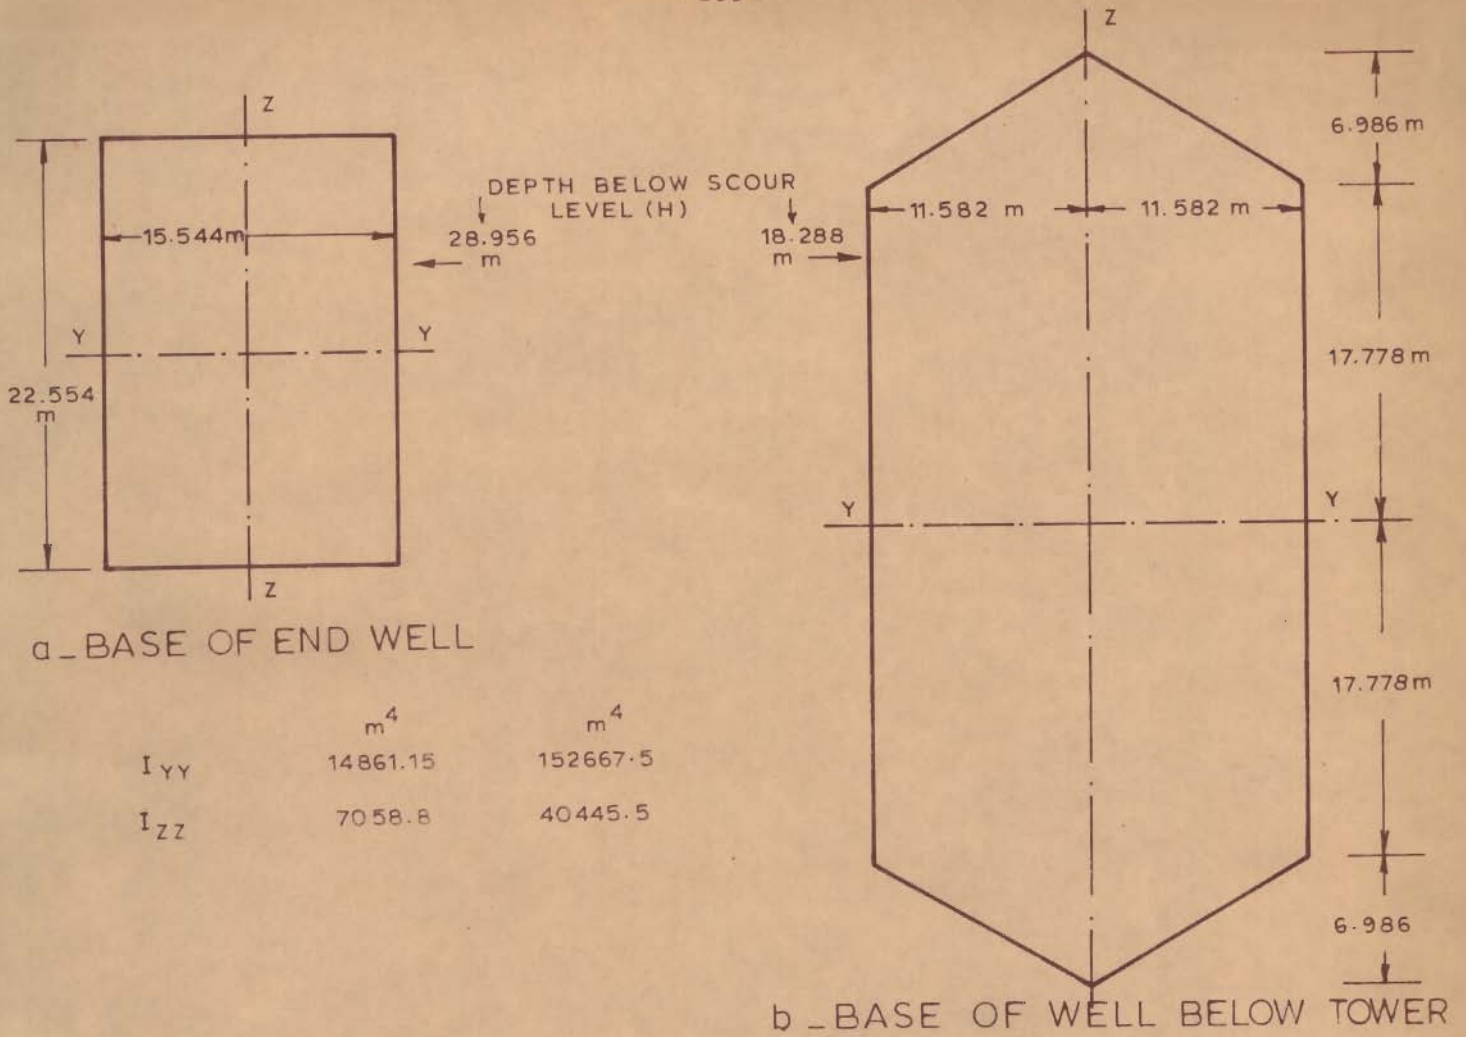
\_SECTIONS AT THE BASE OF CONCRETE WELLS
